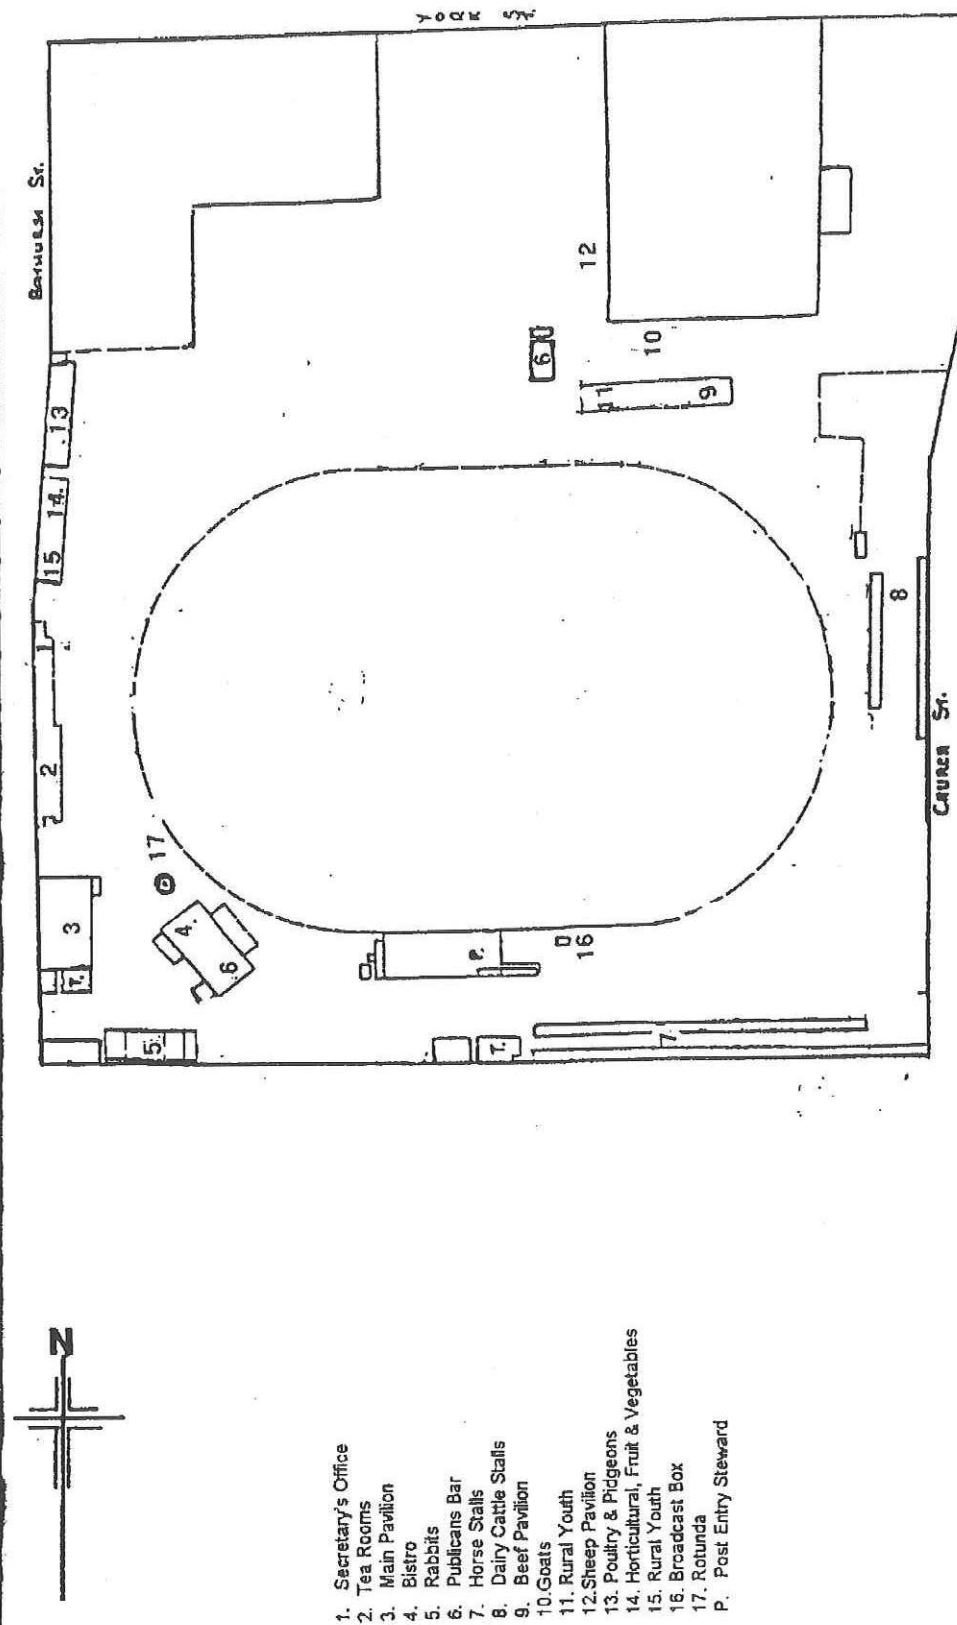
PLAN OF SINGLETON SHOWGROUND
